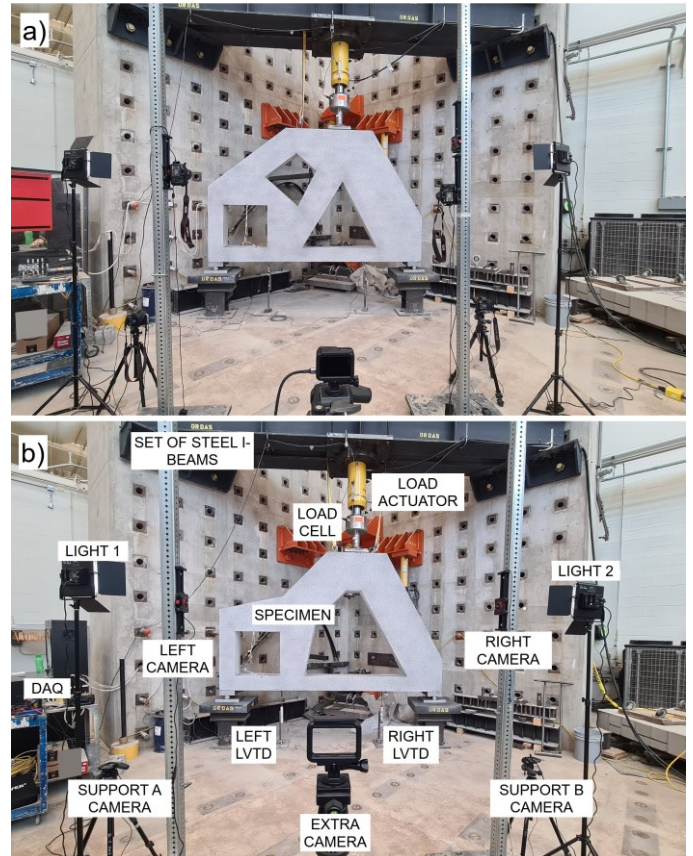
Test setup photographs: a) SIV.a; and b) SIV.c.
